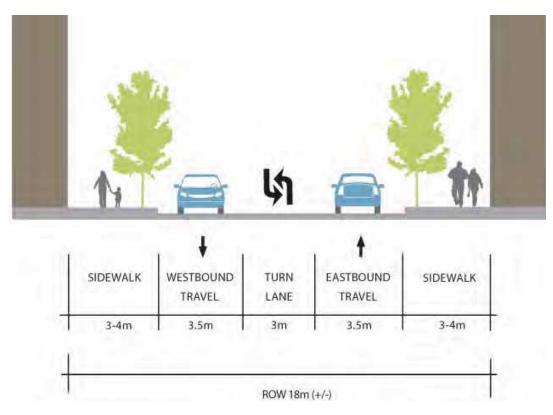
Cross-section for Munition Street Alternative 2 (facing north)
